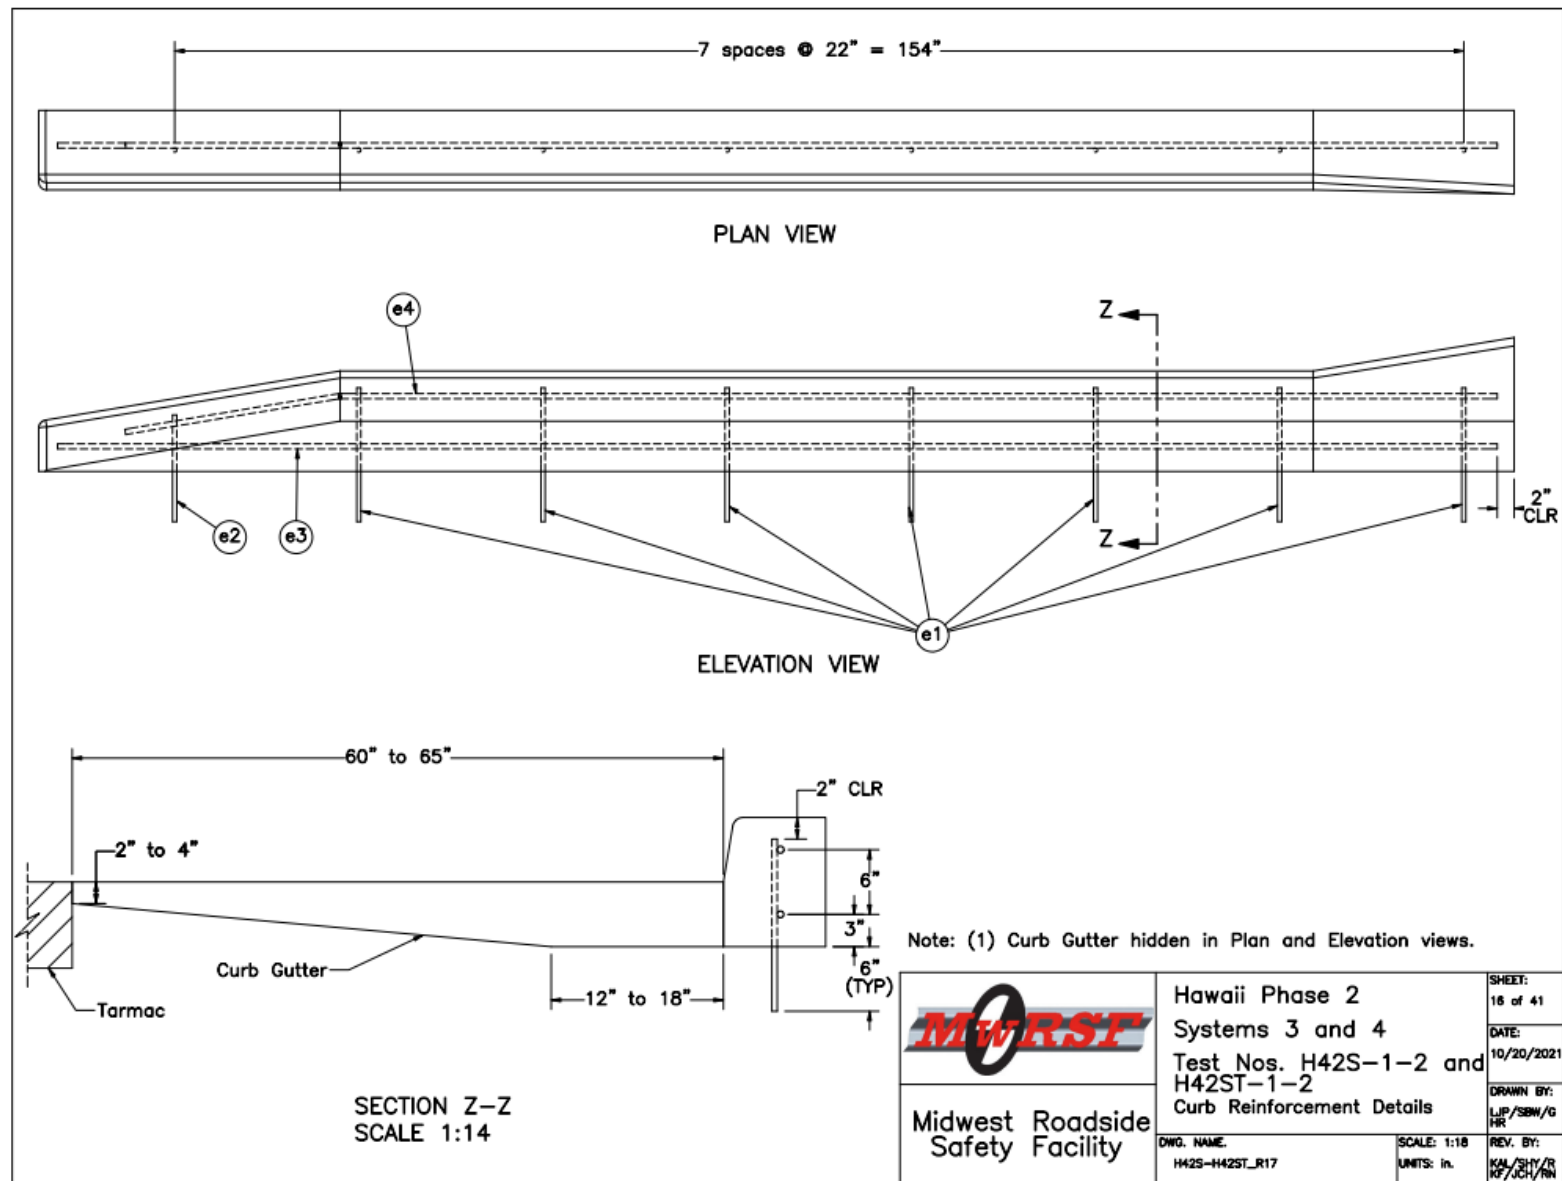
Curb Reinforcement Details, Test Nos. H42ST-1 and H42ST-2
